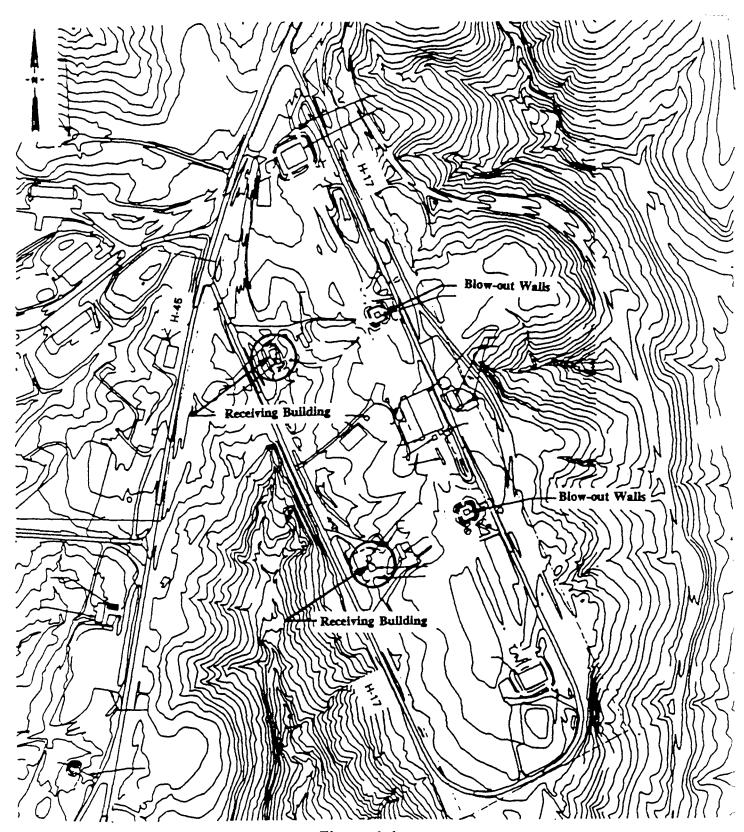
SWMU #12/14 Mine Fill A Soil Excavation Area
